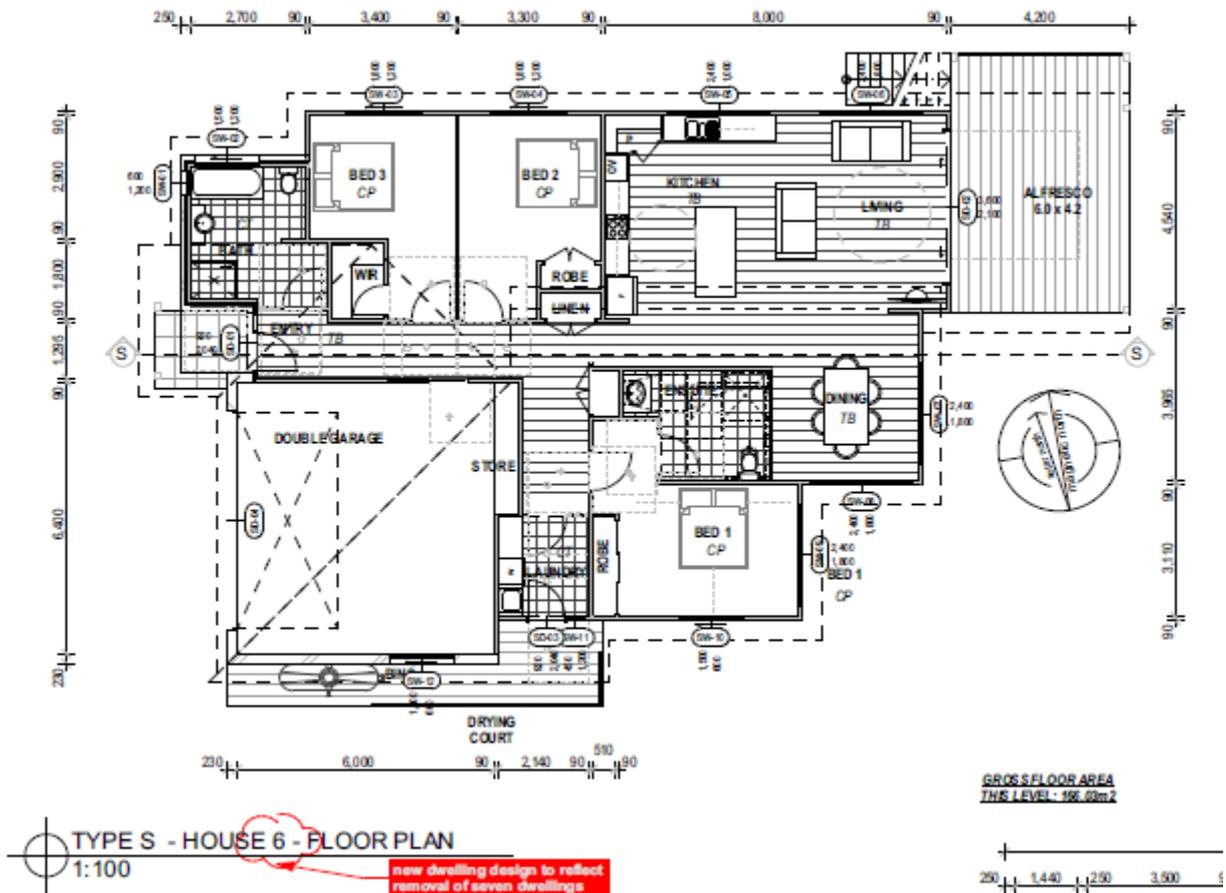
Proposed Housing Type S Floor Plan (Dwelling 6)
